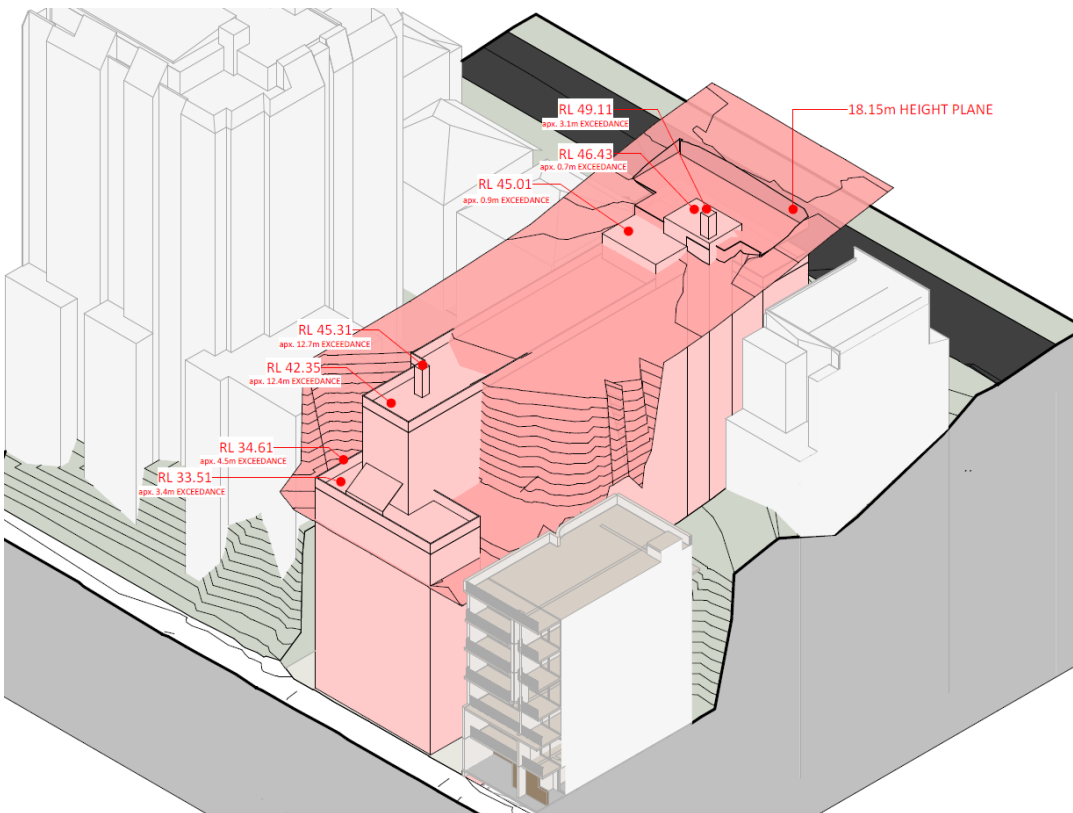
Height blanket diagrams of existing building (18.15m height plane)
